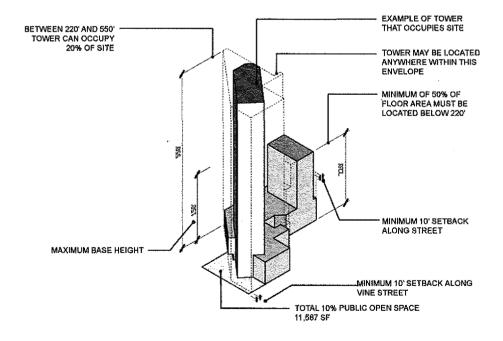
c.1: East Site - 550 Feet Maximum Tower Height
